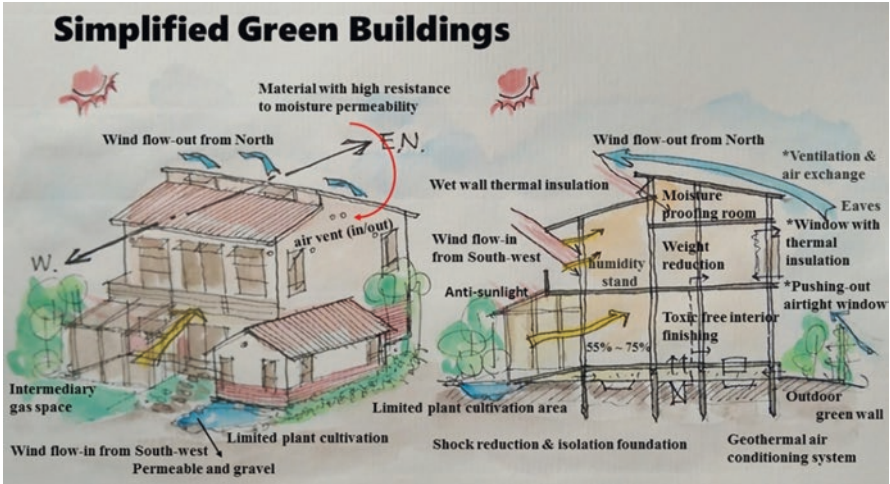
Concept of a simplified green building model for a detached house on the plains of western Taiwan
